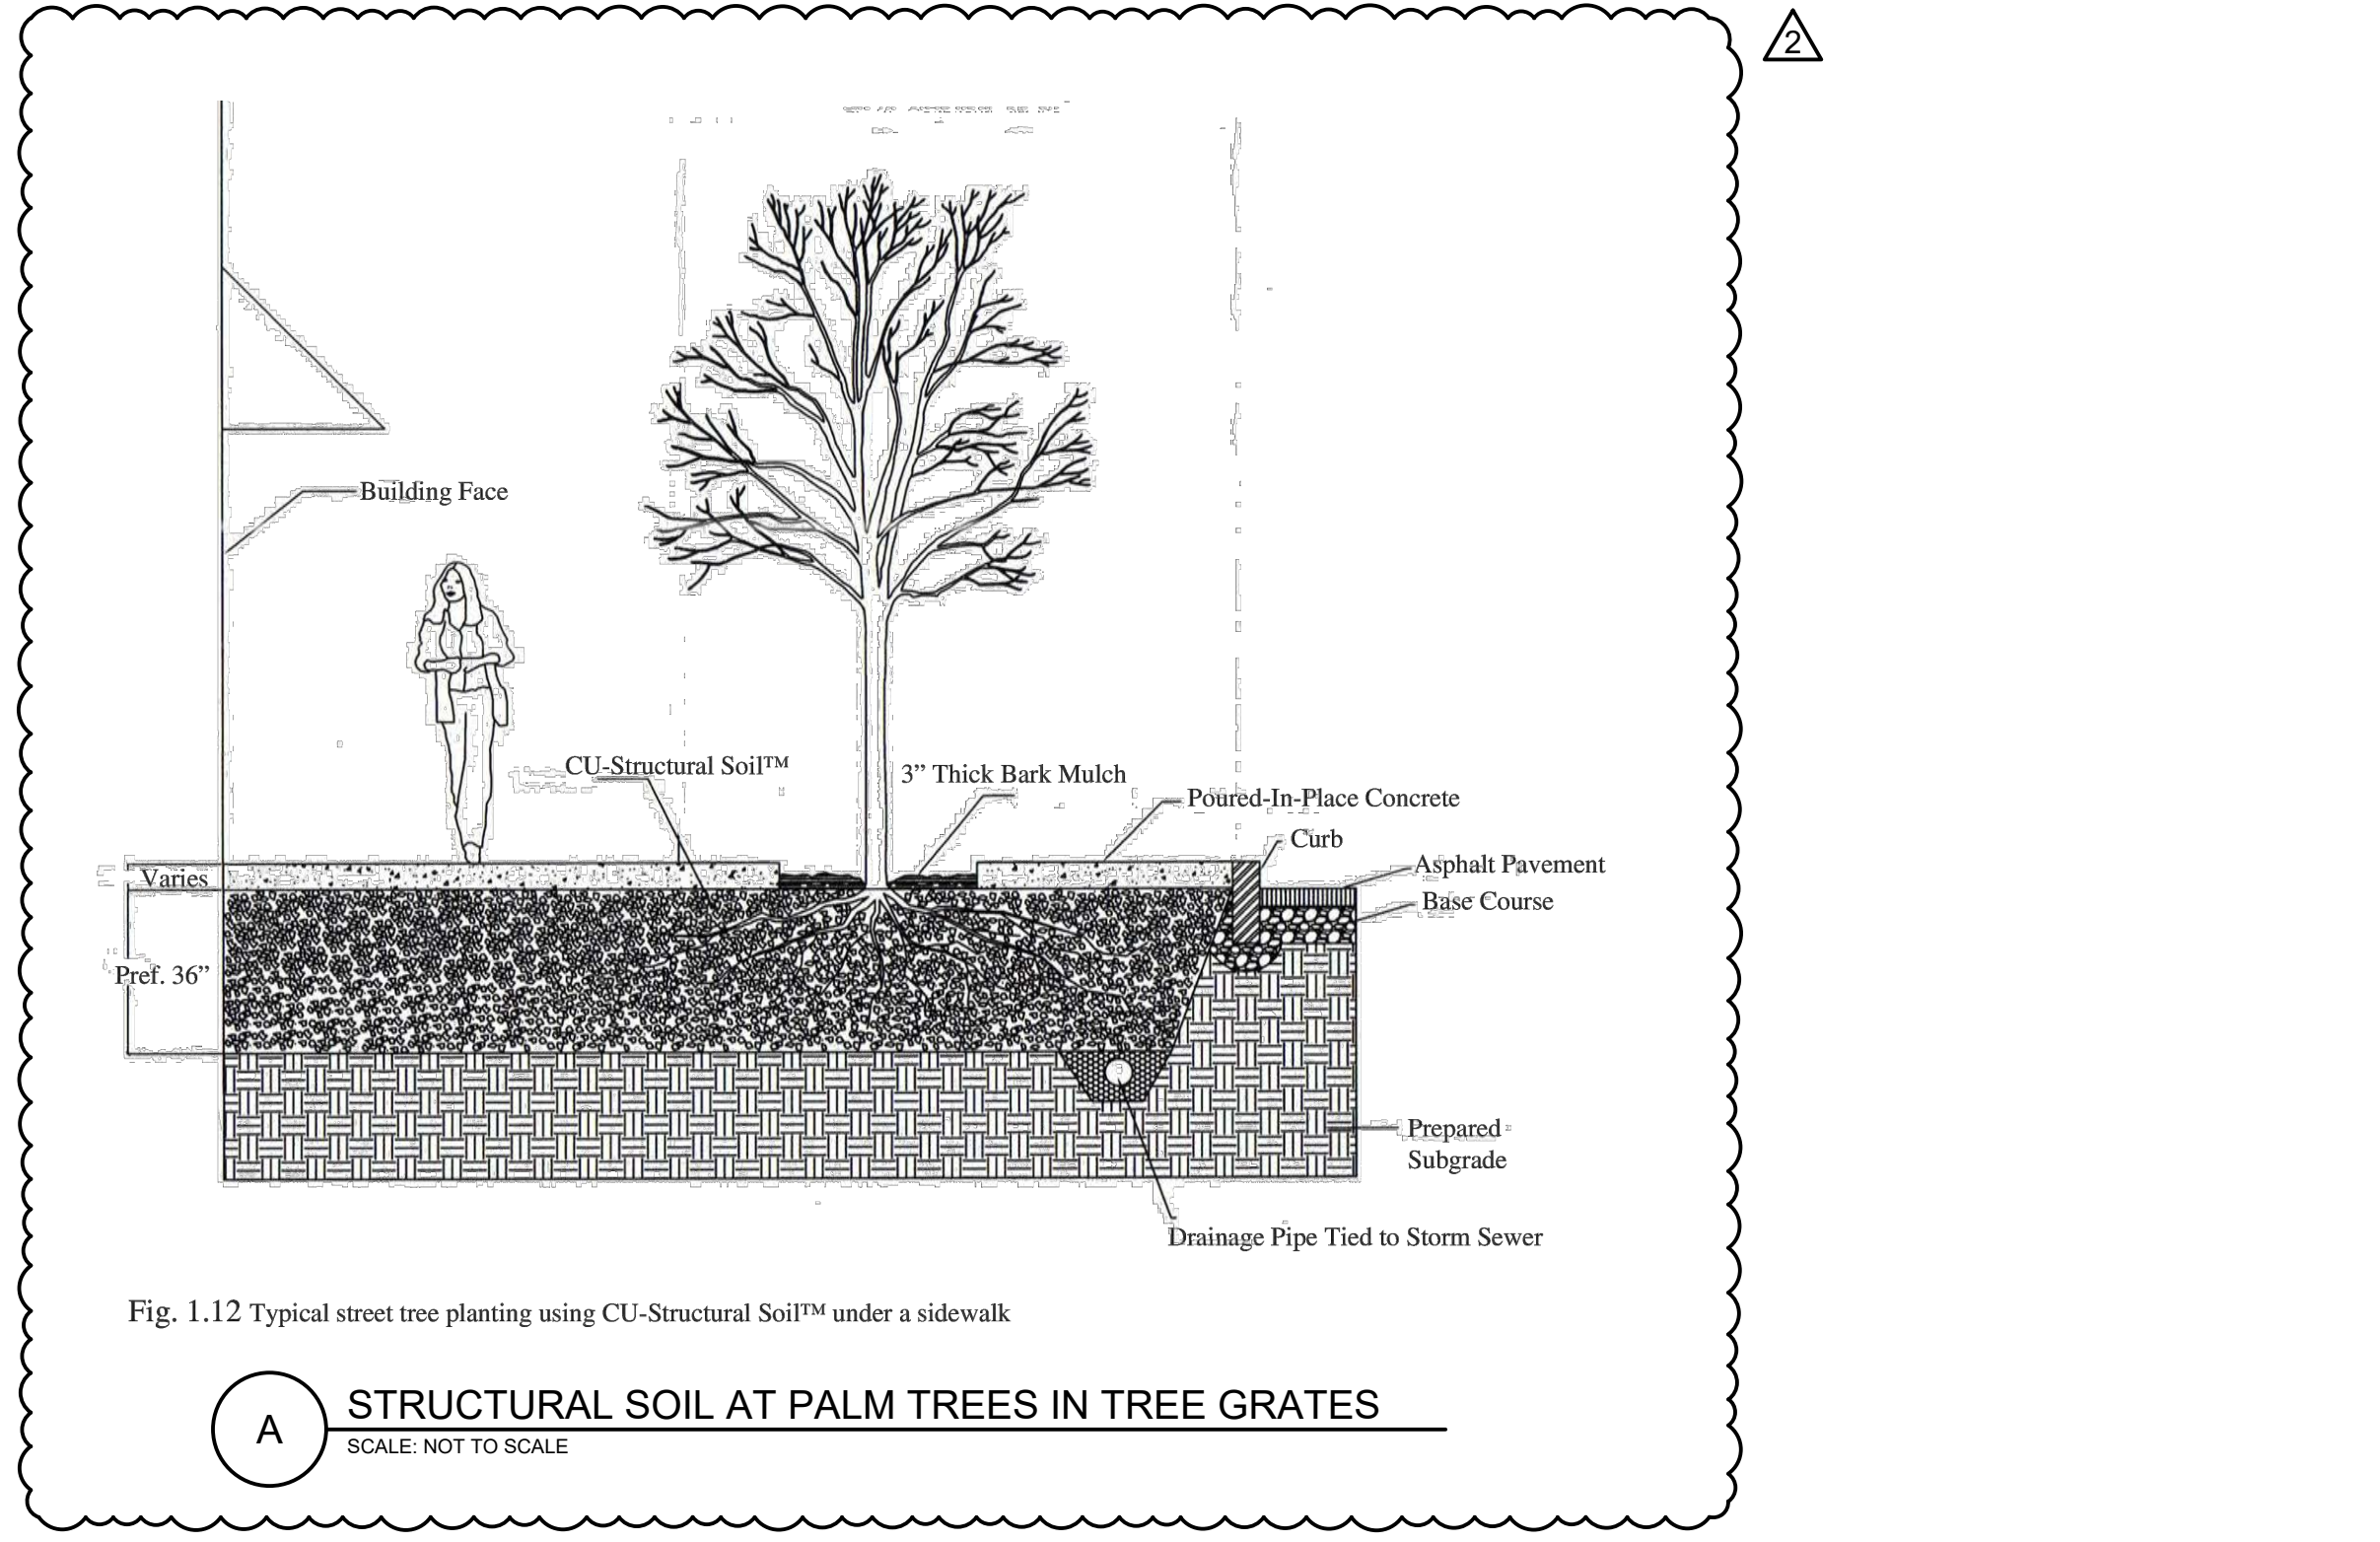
Typical street tree planting using CU-Structural Soil™ under a sidewalk
